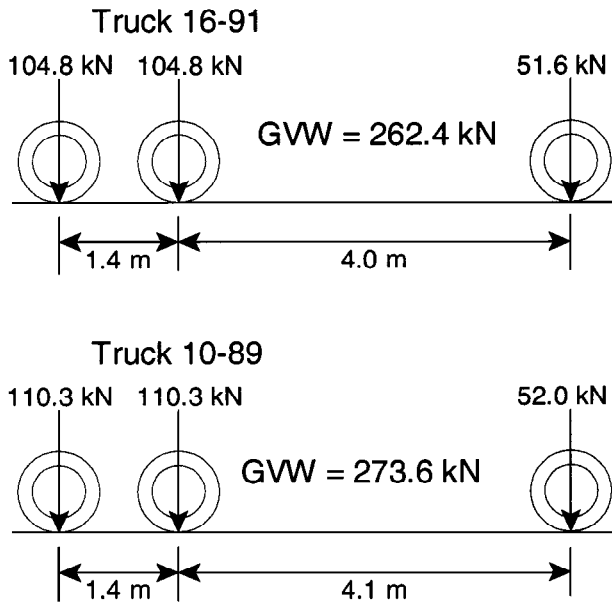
Truck configurations and axle loads for load test 1. For both trucks, vehicle track, measured center-to-center of rear tires, was 1.8 m (6 ft) wide.
